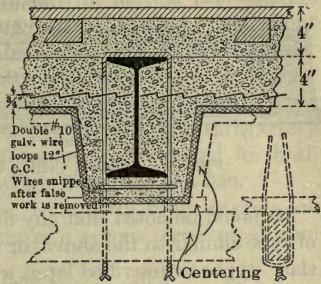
Paneled Floor Construction, U. S. Court House & P. O., Spokane, Wash.
